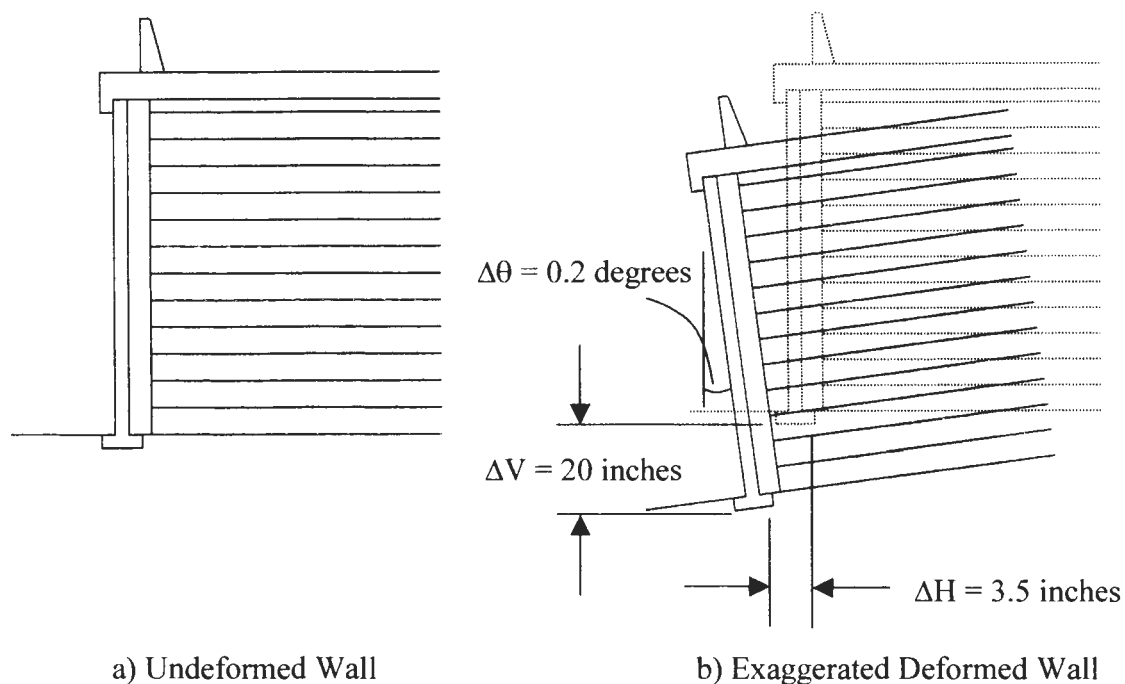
Comparison of the undeformed wall to an exaggeration of the deformed wall
